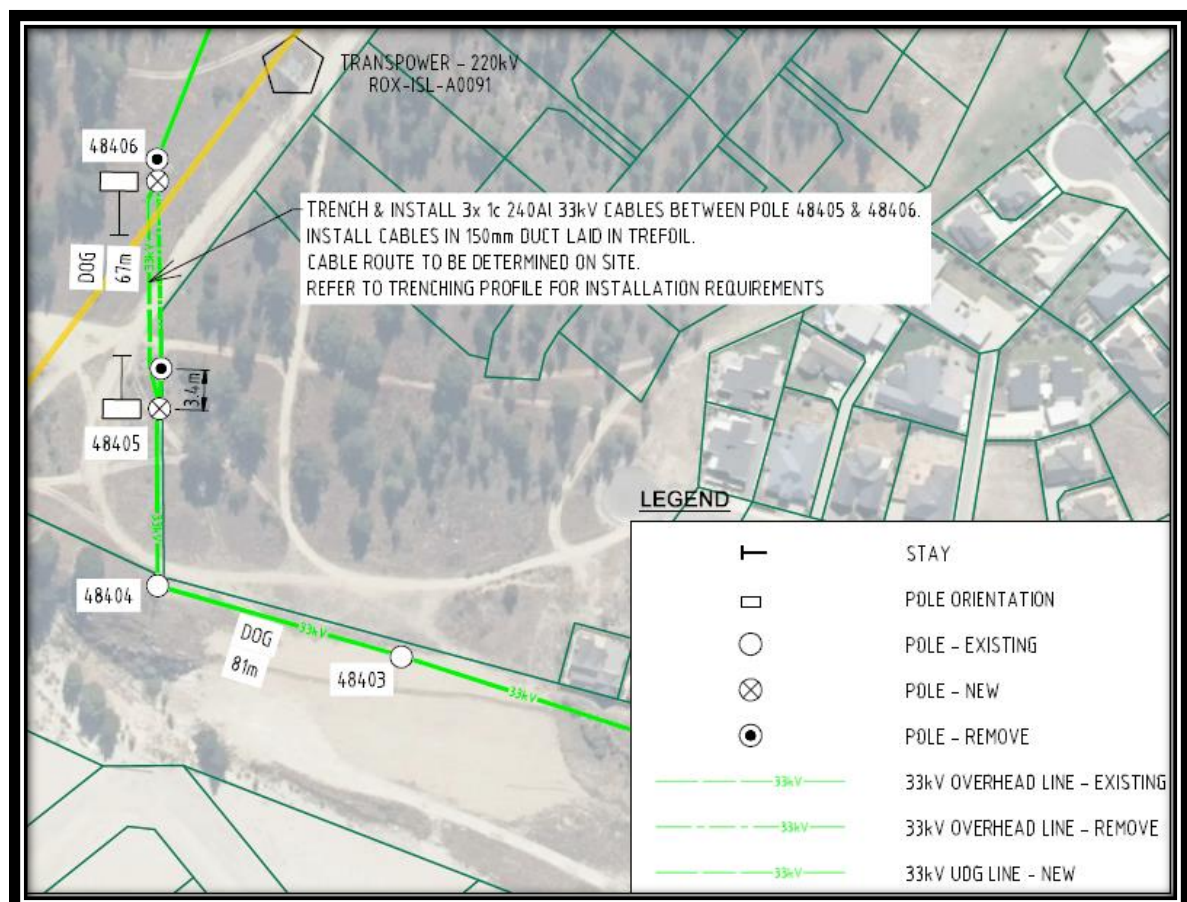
Plan of proposed works (to underground a section of Aurora's 33kV lines)
